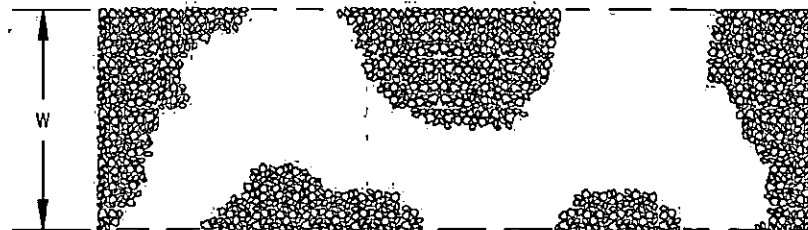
ROAD/PARKING STABILIZATION
